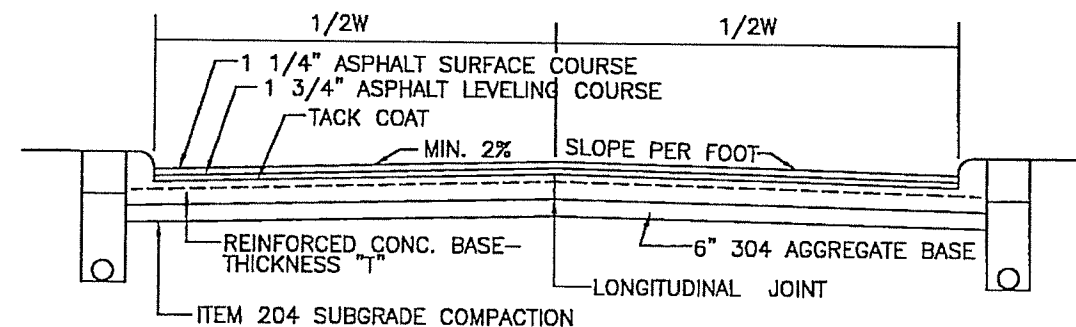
DETAIL OF INTEGRAL CONCRETE CURB & BASE (ASPHALT SURFACE)
